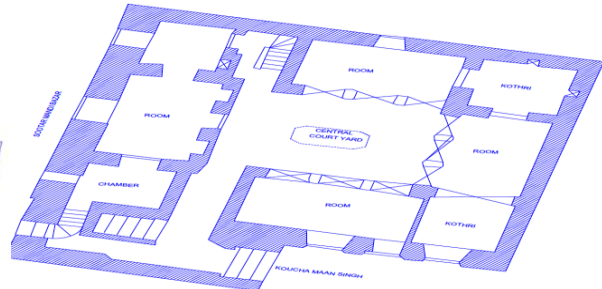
Baithak/Dewaan Khana in Type -B Houses D/125 (Source: Authors)
